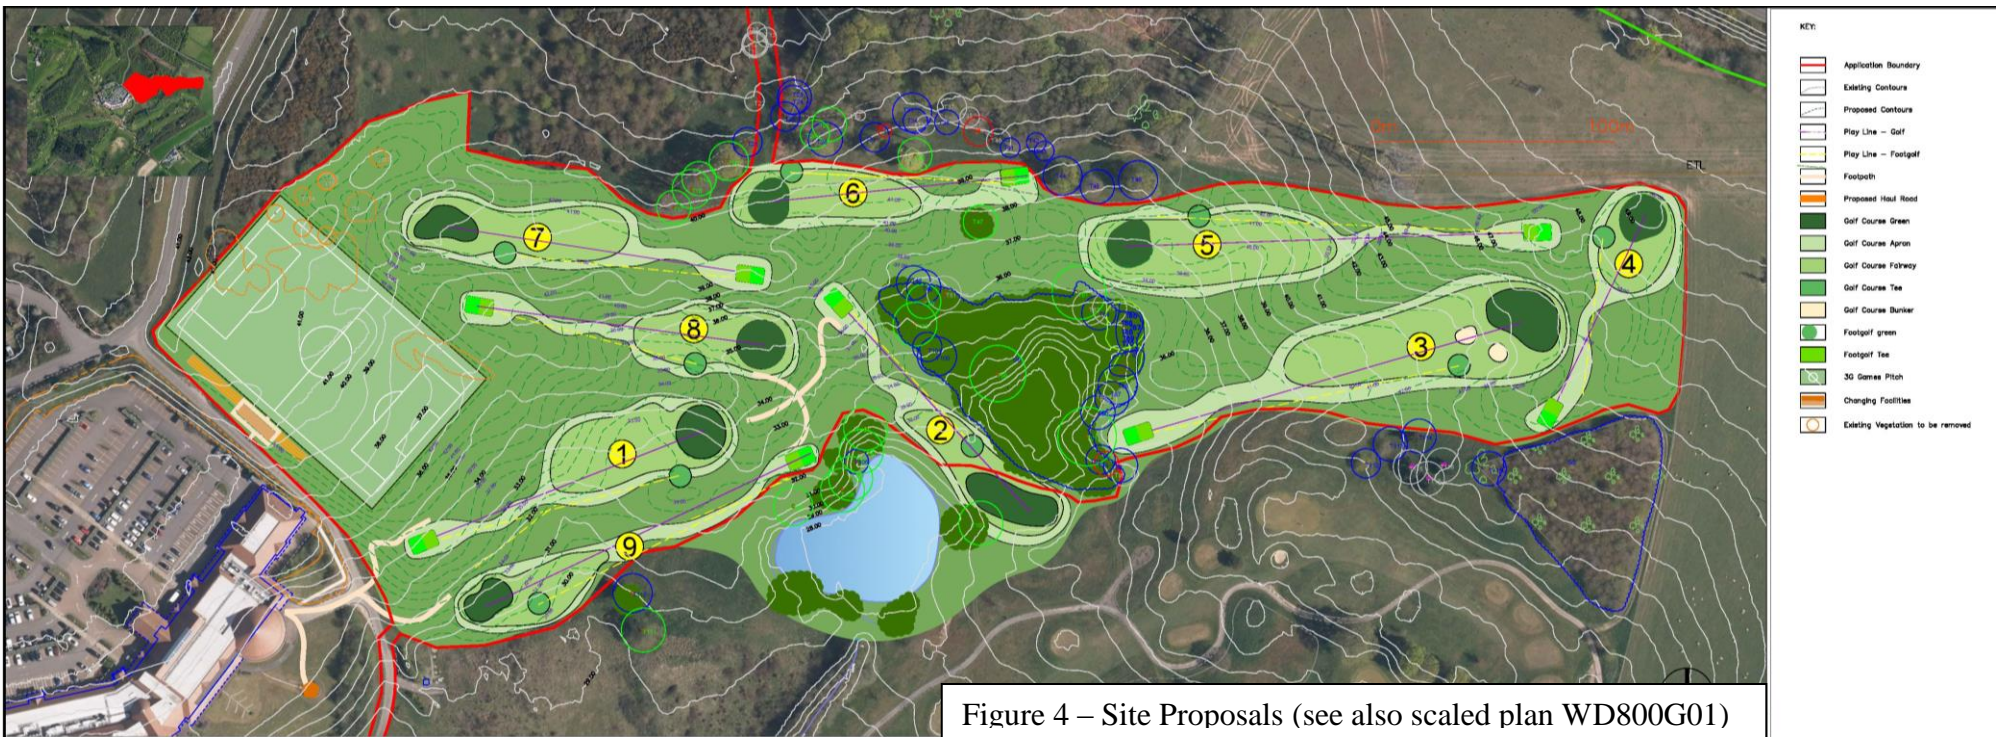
Site Proposals (see also scaled plan WD800G01)
